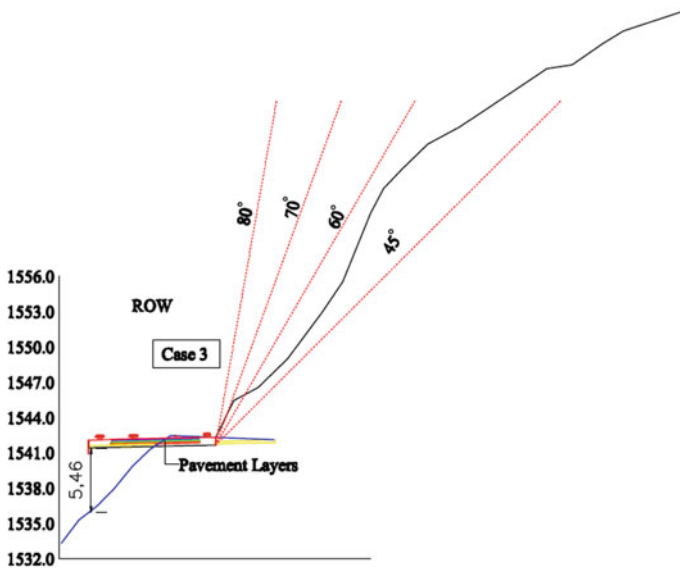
Typical cross-section of single lane road to be widened to double lane road towards downhill side
